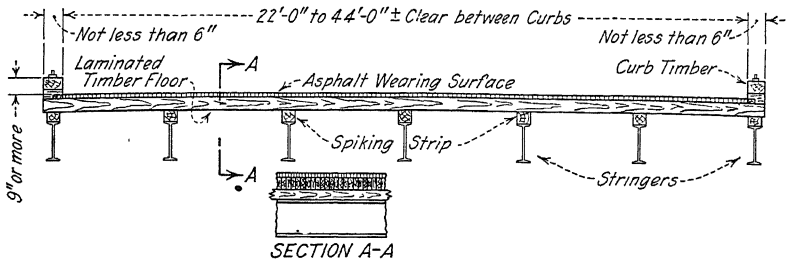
Cross-Section of Typical Highway-Bridge Floor with Timber Deck.
